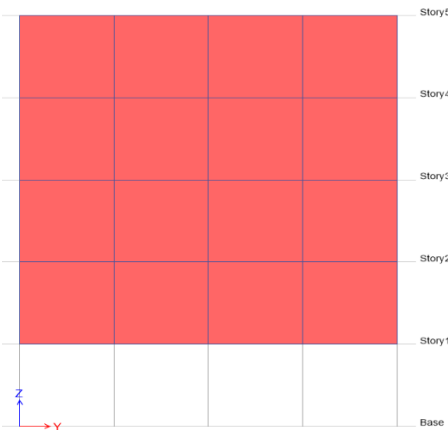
Soft Storey cum Floating Column (SSFC) Structure Elevation for G + 5
